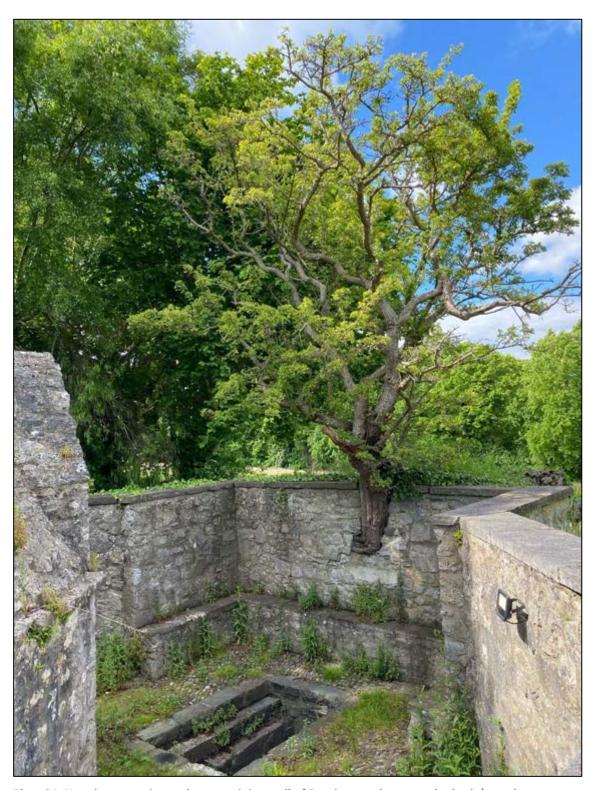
Hawthorn tree in northern retaining wall of Baptistry and rectangular bath/trough.
